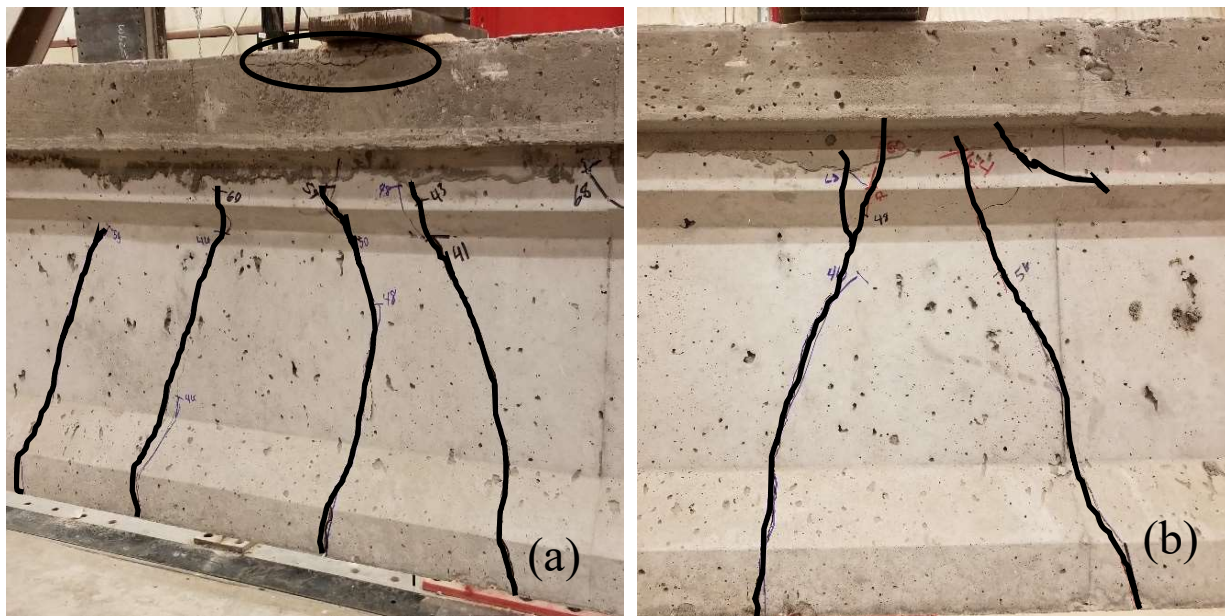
Crushed concrete deck in the NC3-N girder is indicated by a black oval (a) and the final flexural cracking under the load point in the NC3-N (a) and NC3-S (b) girders are indicated by dark lines.
